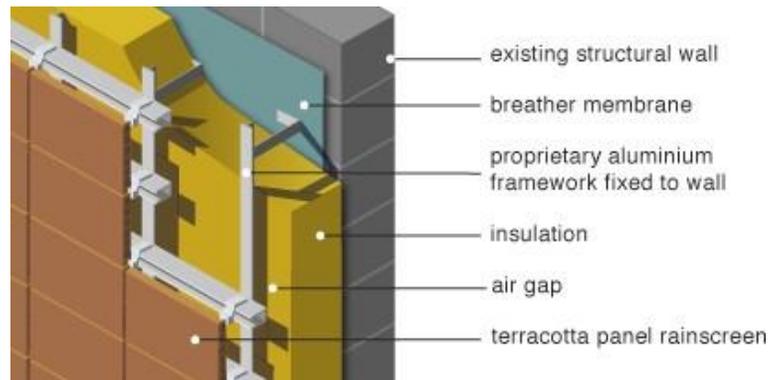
External wall insulation refers to a common method of applying a dry cladding system to an existing solid masonry wall. (Source: www.greenspec.co.uk building design), (Chinazzo, 2013-14)
